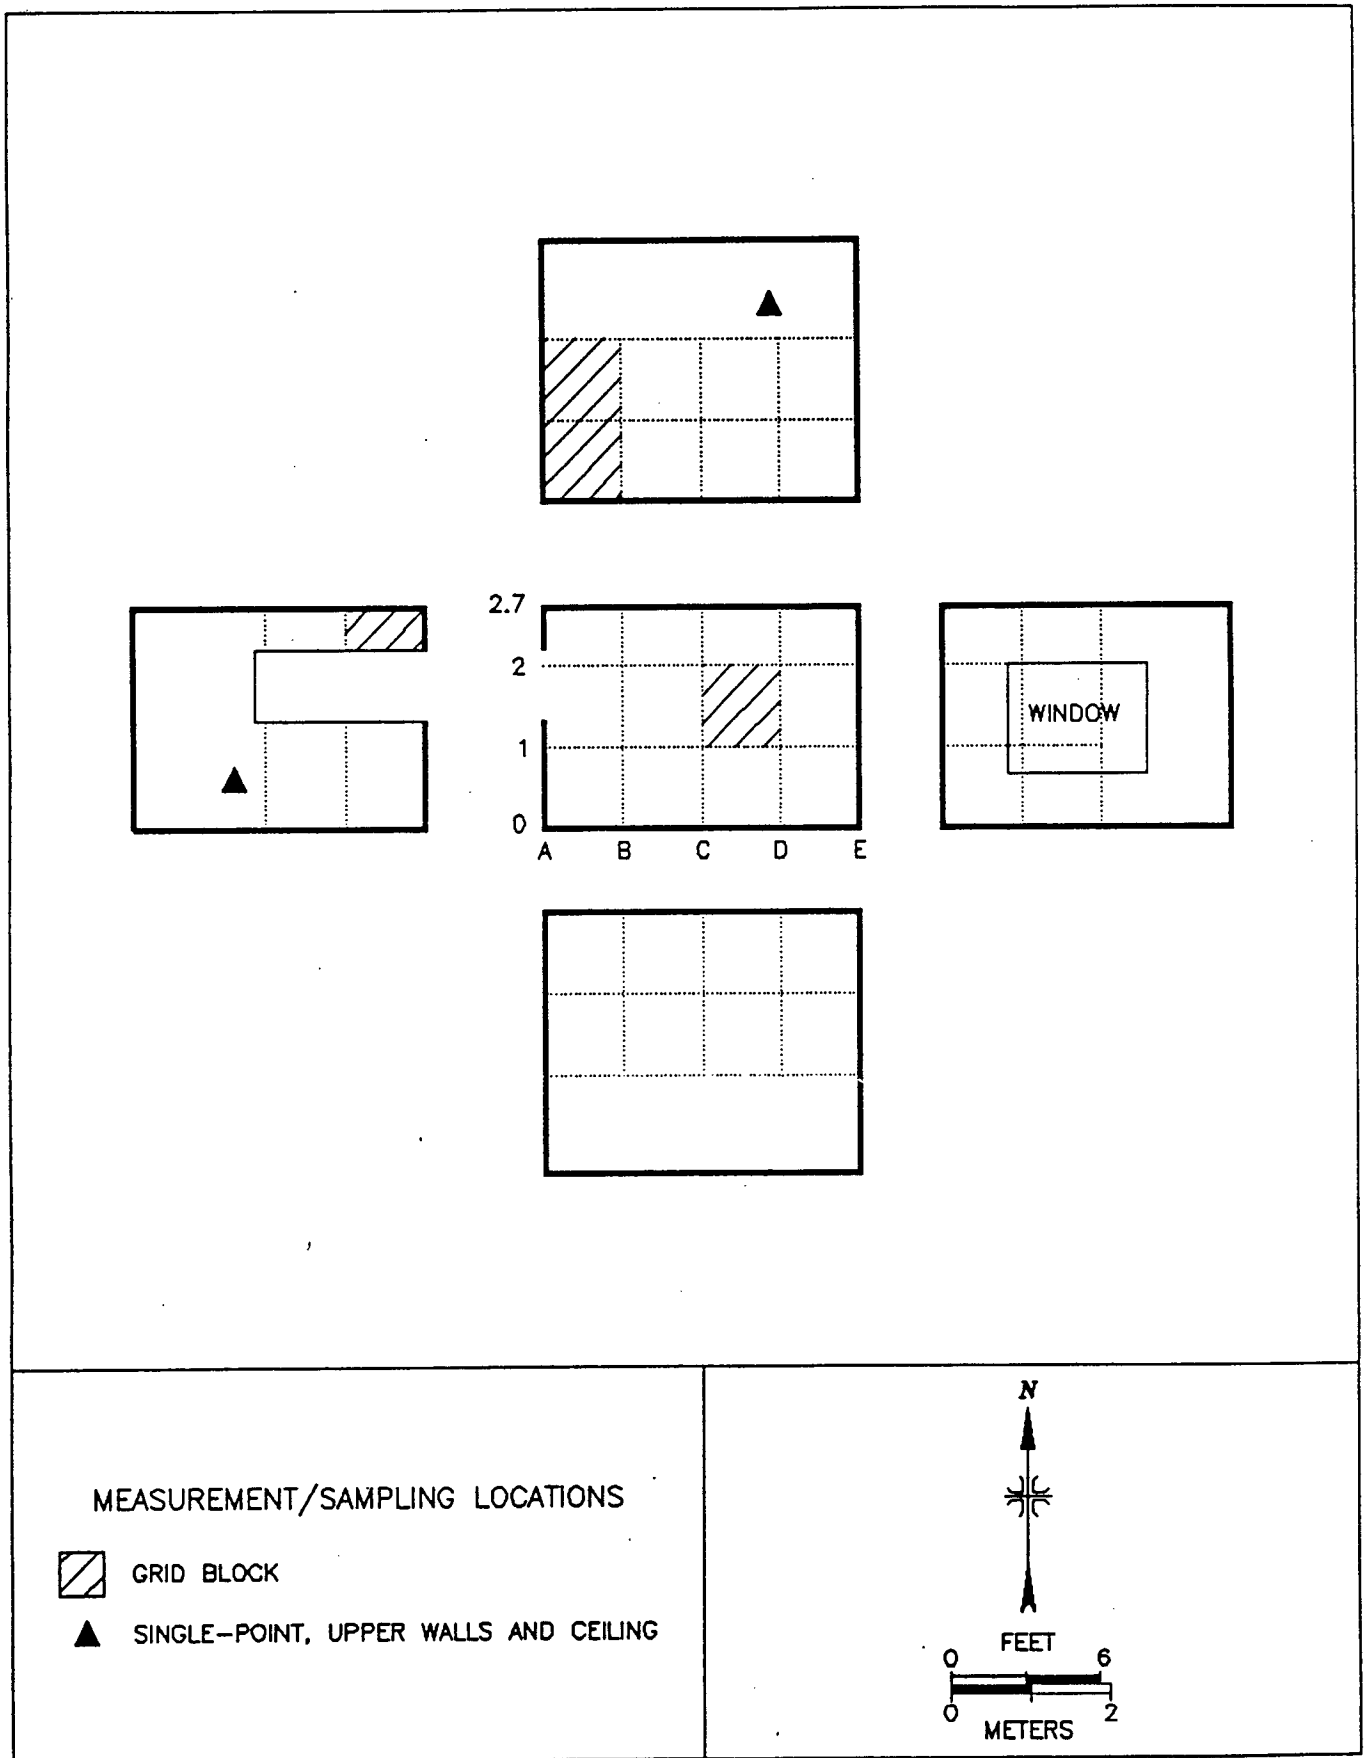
Building 401A, Room 16 — Measurement and Sampling Locations
